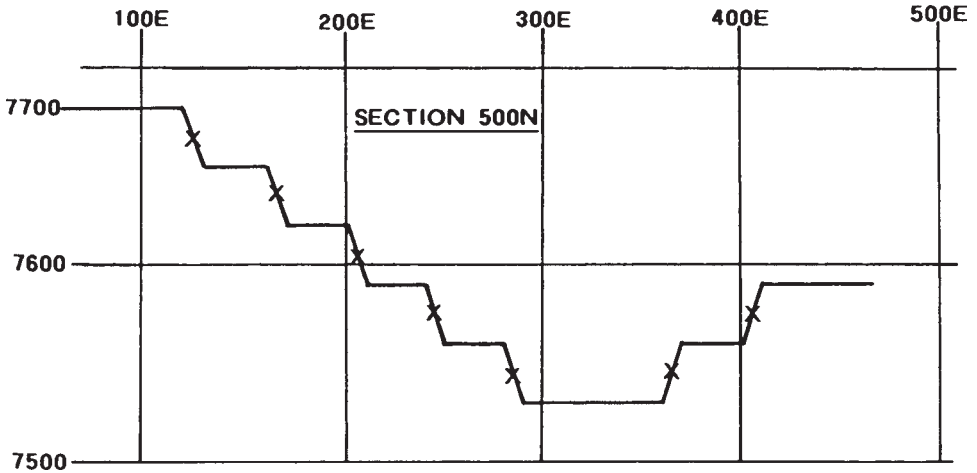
Procedure of denoting the median midbench elevation line on the bench face.
